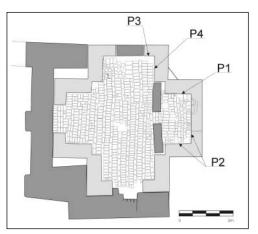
Plan of the Cruciform Building showing location of preserved wall paintings
